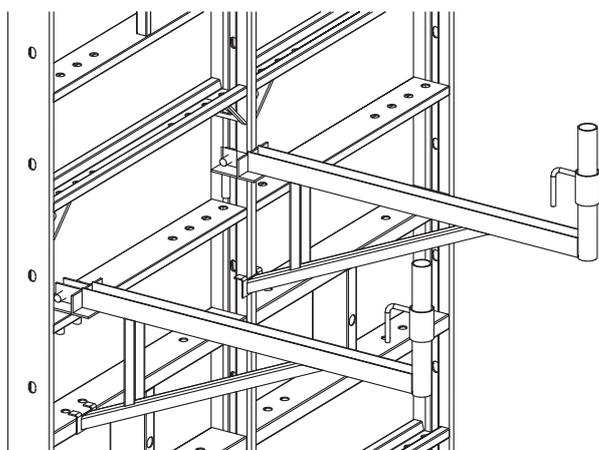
Sample method of installation of the working platform on the formwork
